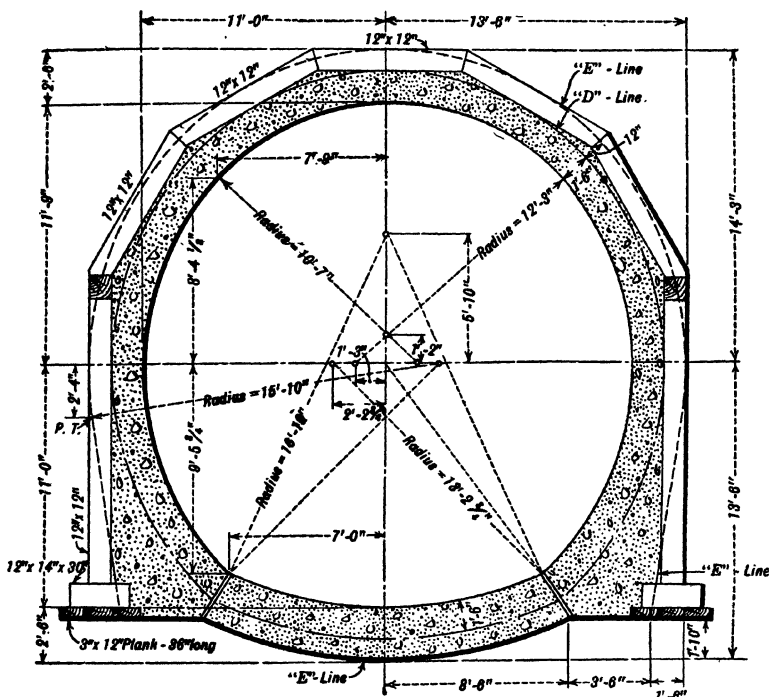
Standard Earth Section. Davis Bridge Development, New England Power Co
